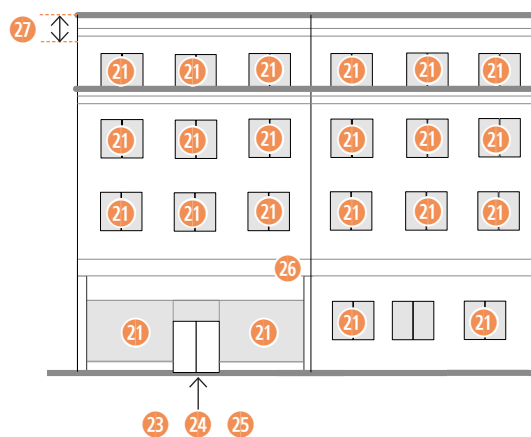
D Workshop/Warehouse Building: Street Facade Requirements
